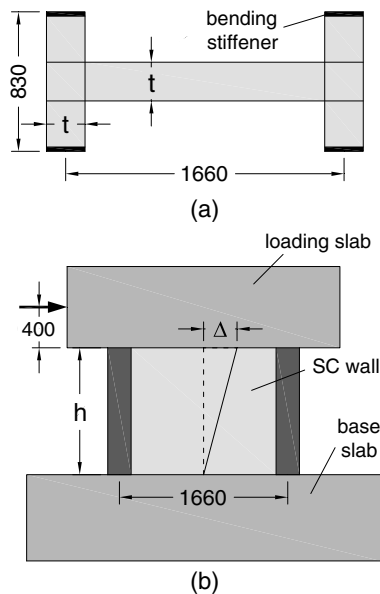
Configuration of Sasaki et al. (1995) SC shear wall specimens: (a) cross section; (b) elevation
